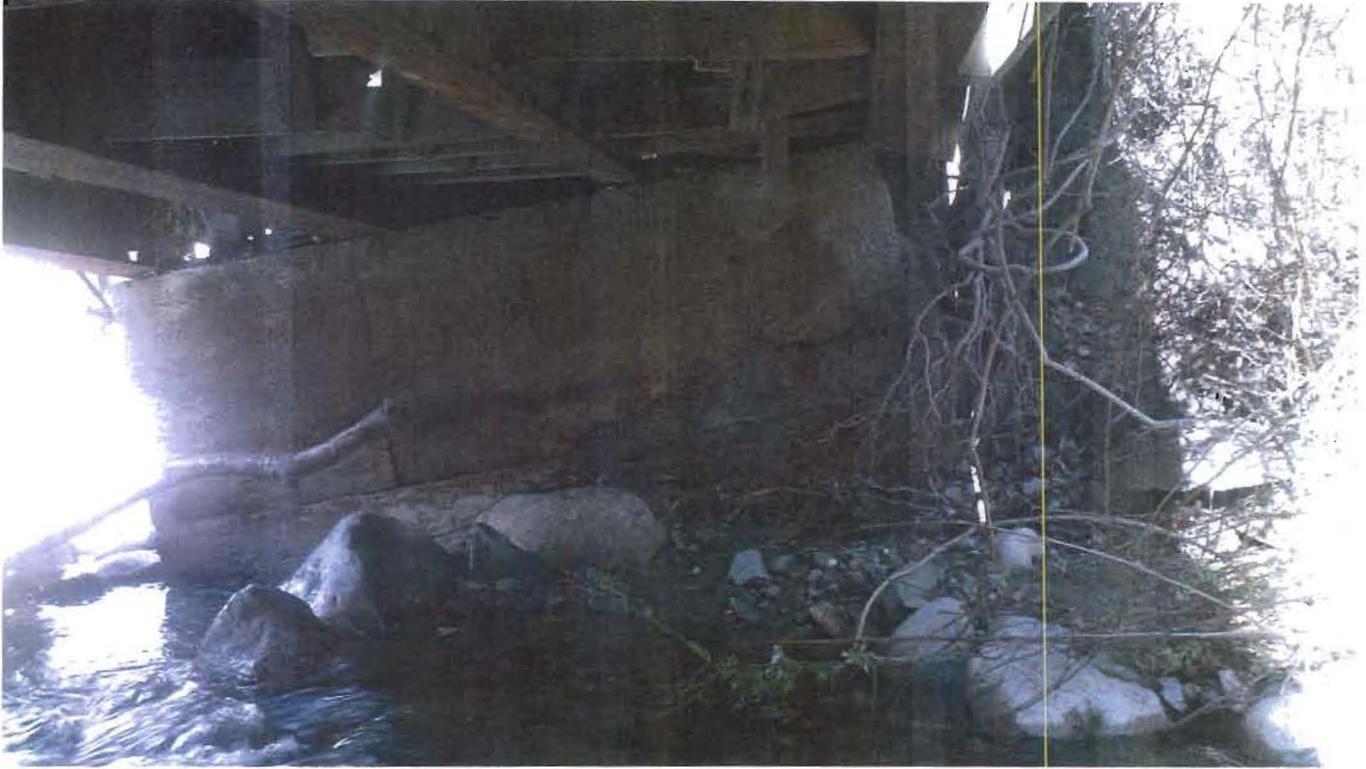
SHOWING UNDERMINED AND DISPLACED BRIDGE ABUTMENT
